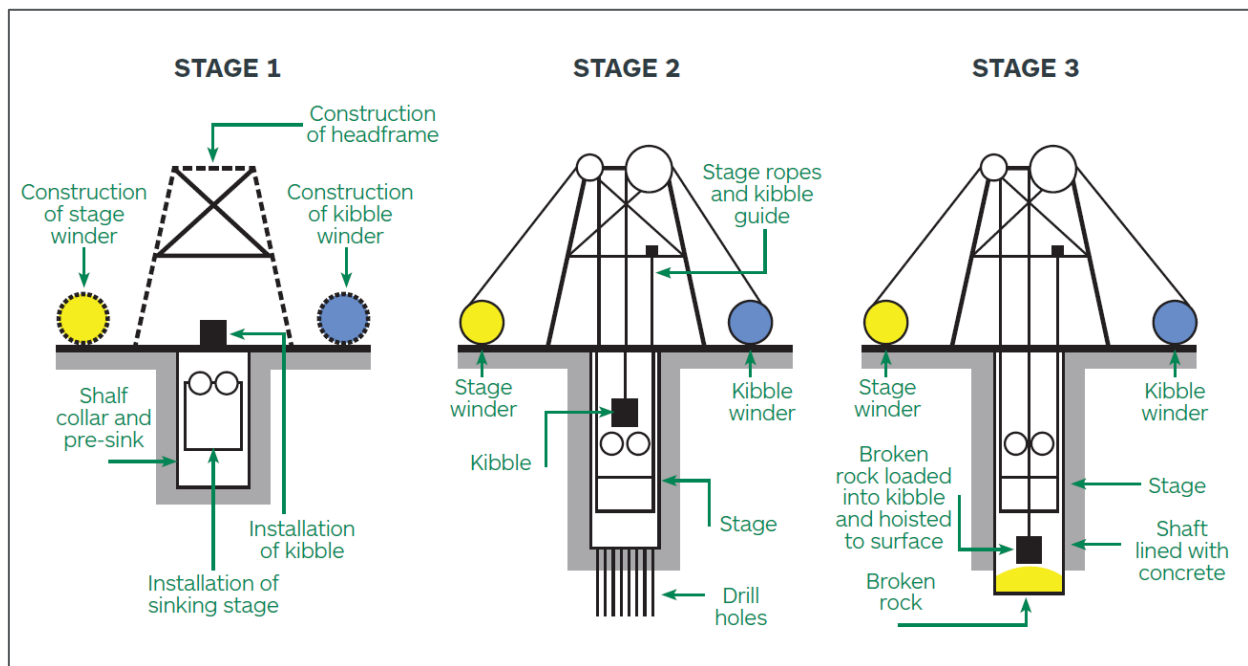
Staged schematic of conventional shaft sinking method using controlled blasting
